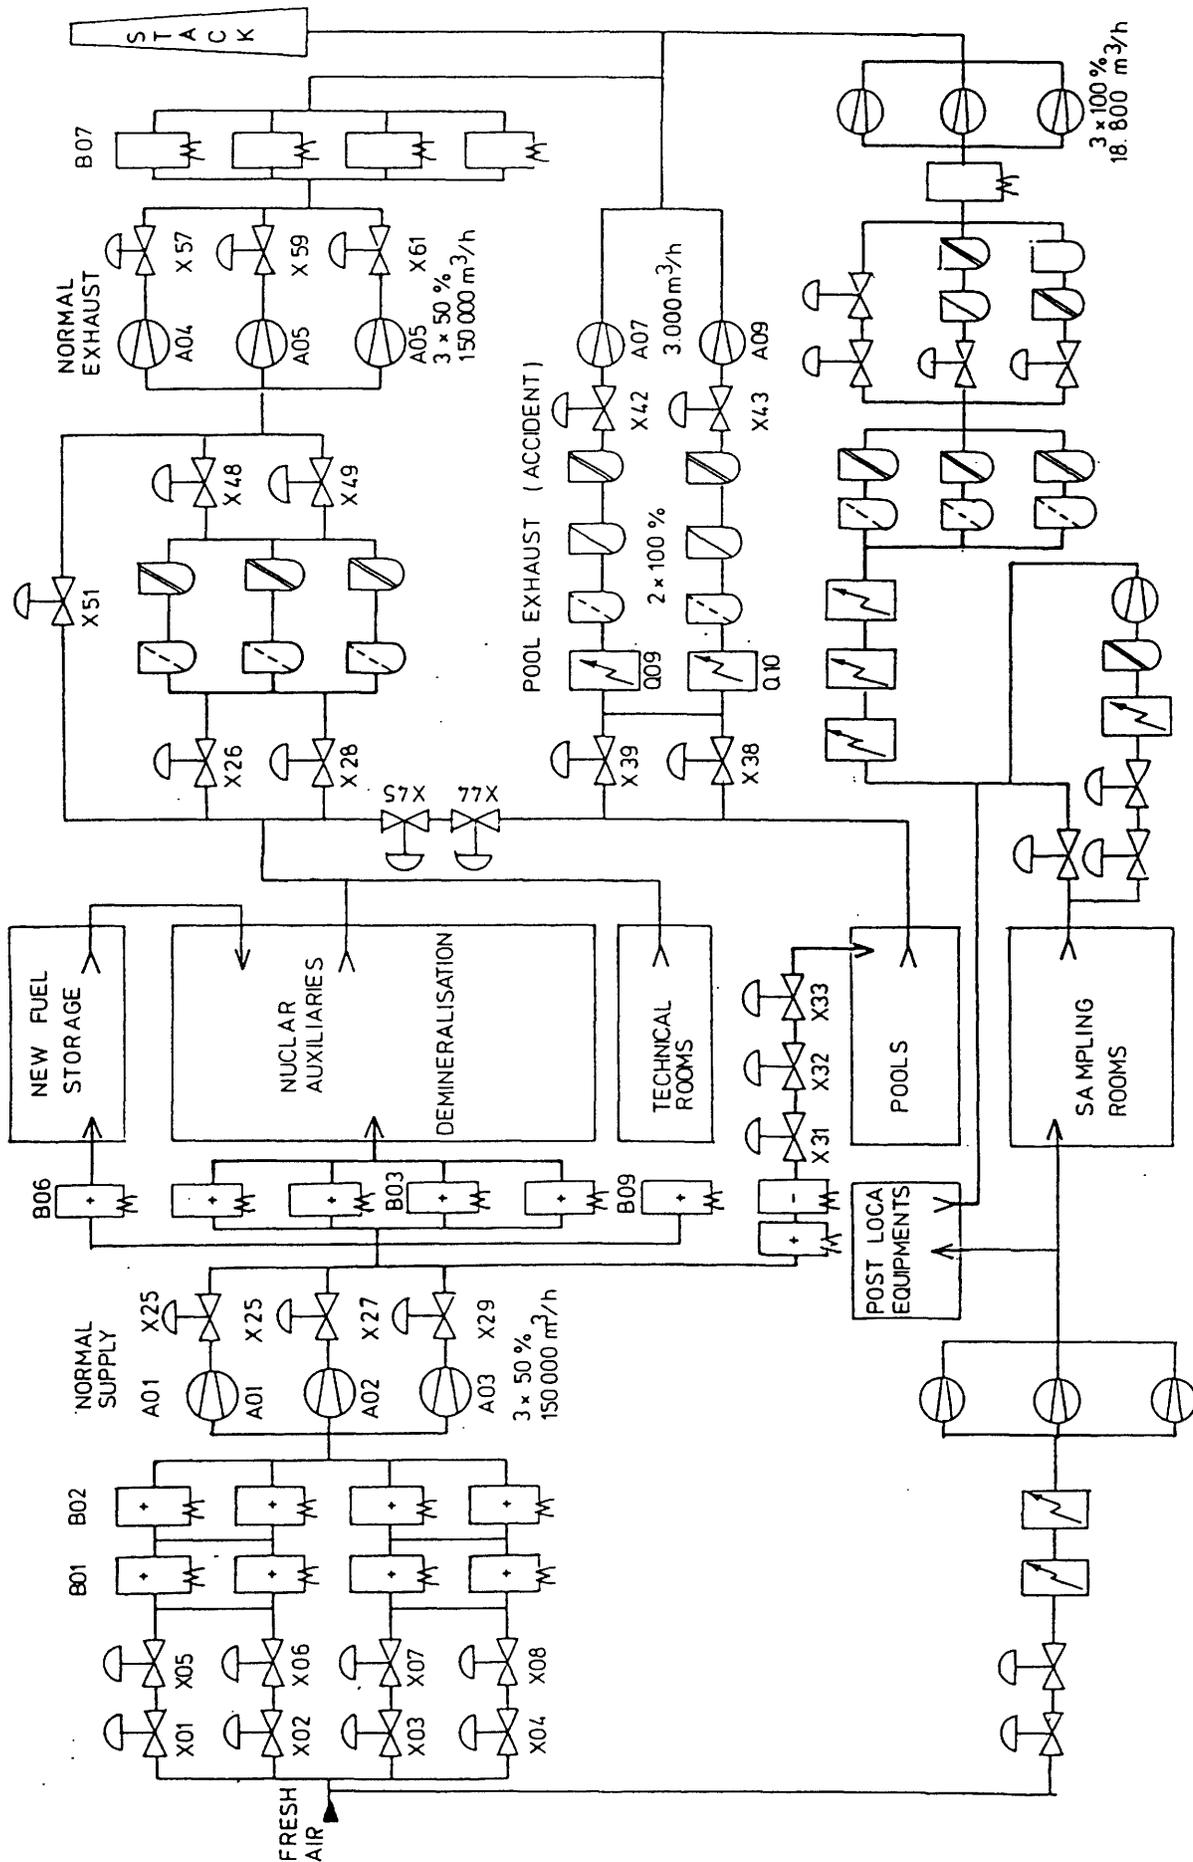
VBP VENTILATION BAN P POOL BUILDING
